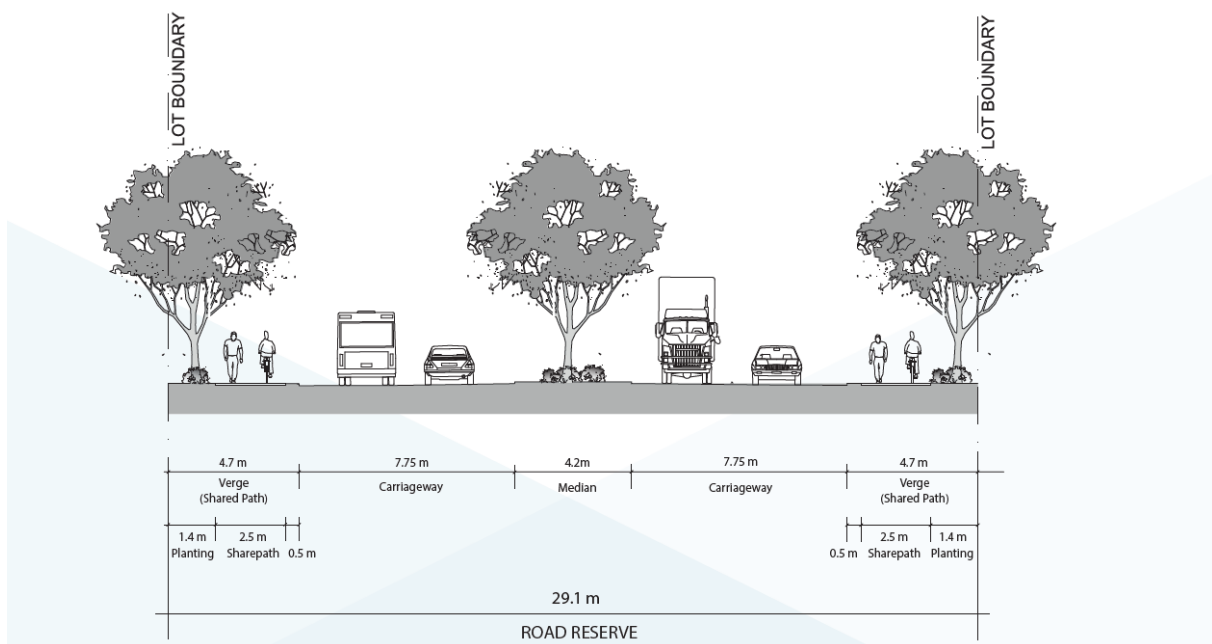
Boulevard Entry (Collector Road) - cross-section (Source: Design + Planning)
